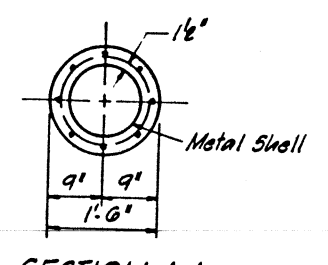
DETAIL OF TAPERED METAL SHELL FOR CAST IN PLACE CONCRETE PILES
